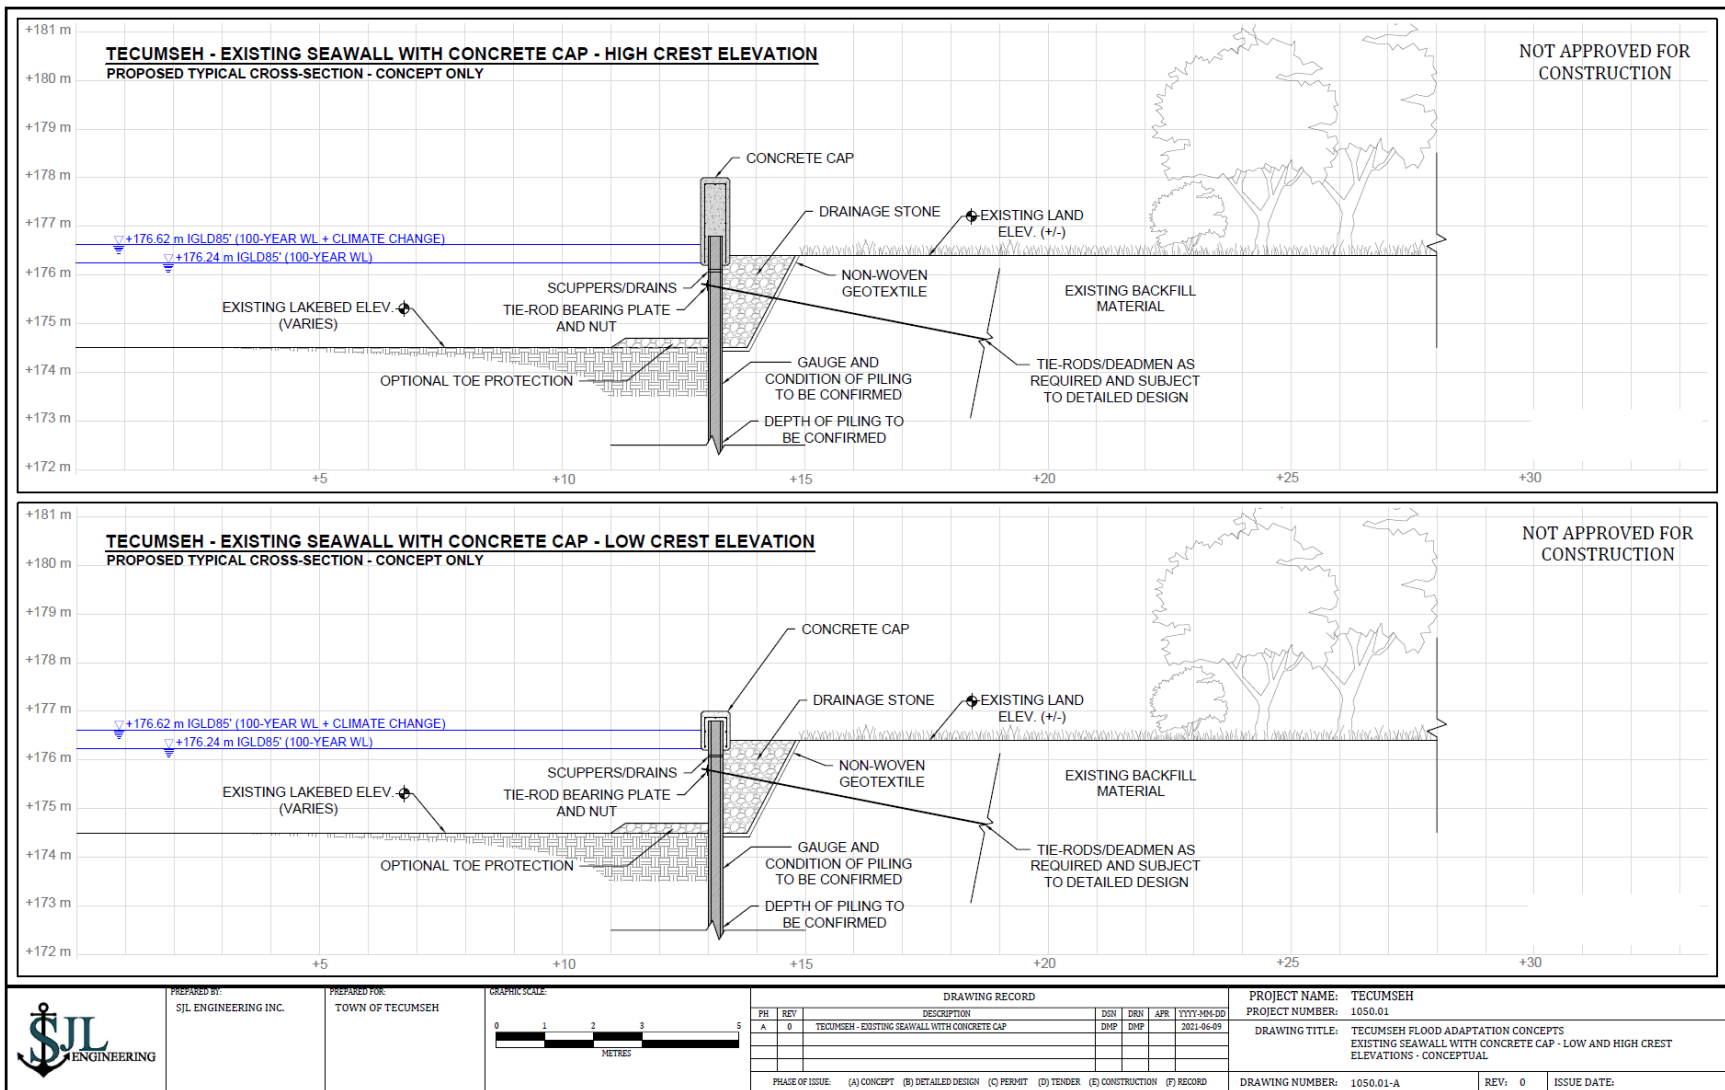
Conceptual Drawing for Crest Upgrades to Existing Seawalls
